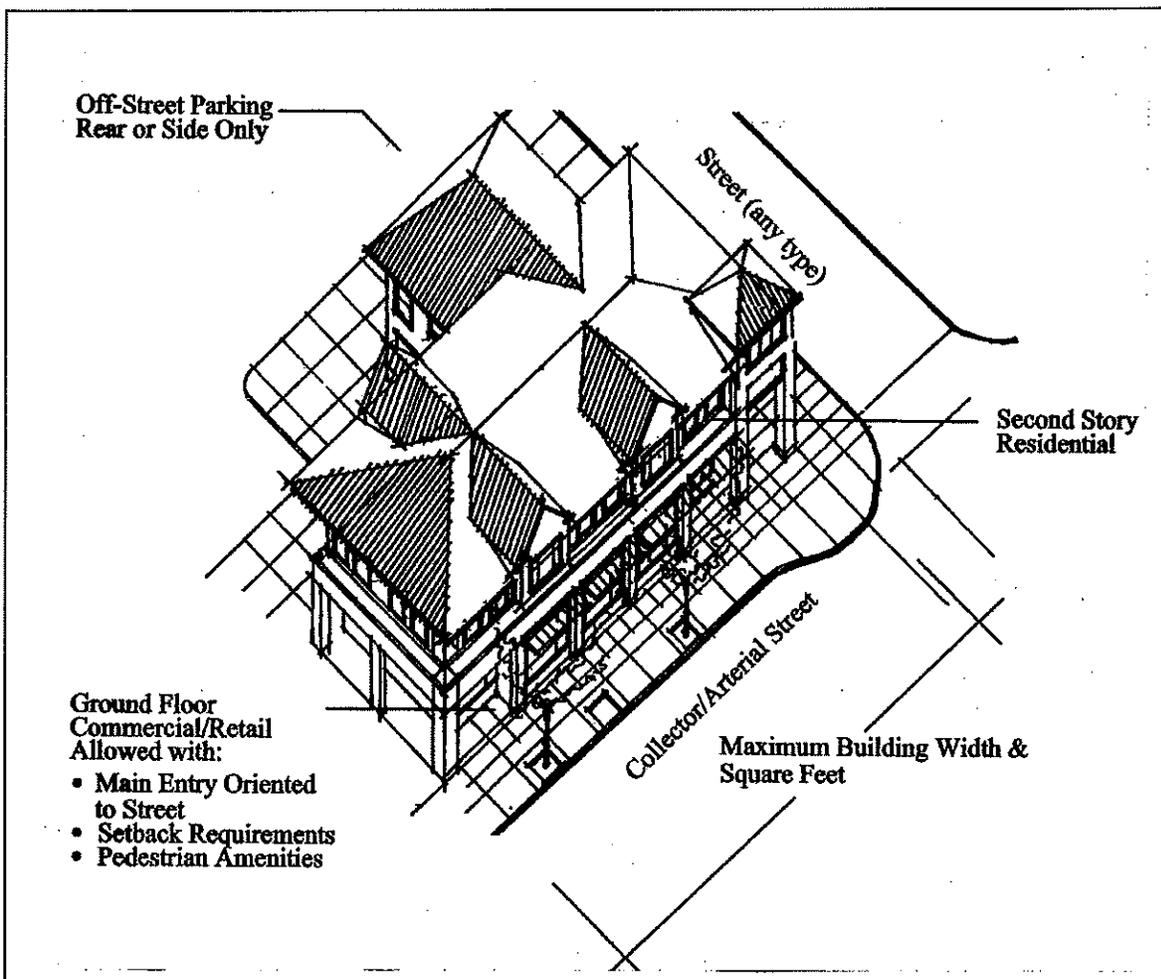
A - Neighborhood Commercial (Example of Site Layout)
